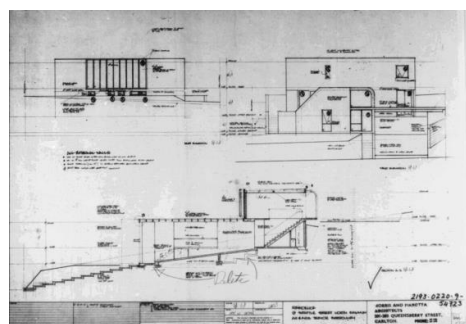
Original working drawing sheet. (Source: City of Boroondara)
